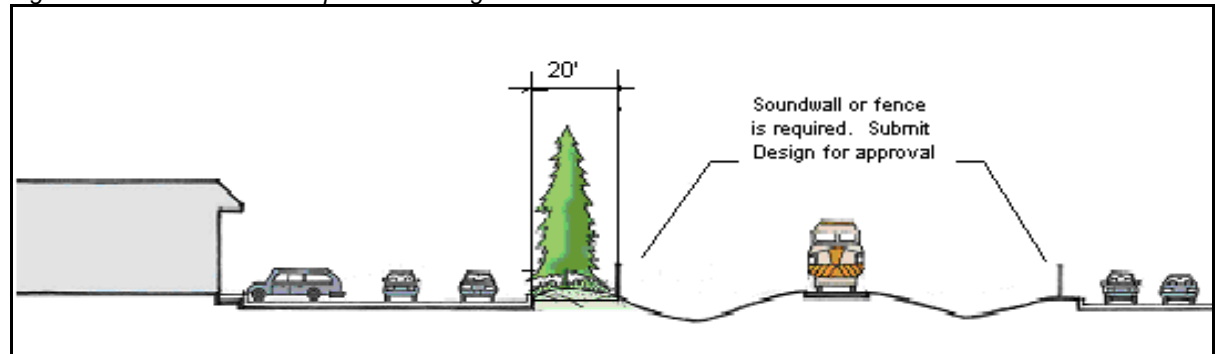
BIP Setback Without Parking (Arterial Street)
